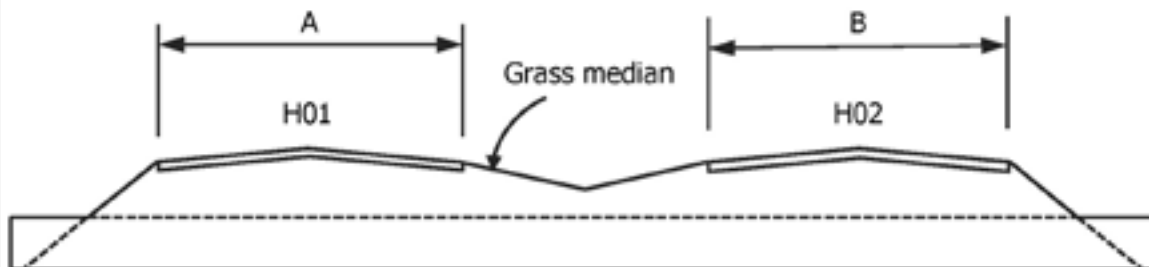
Cross-section view of two highway features carried on the pipe culvert under fill with a grass median.
